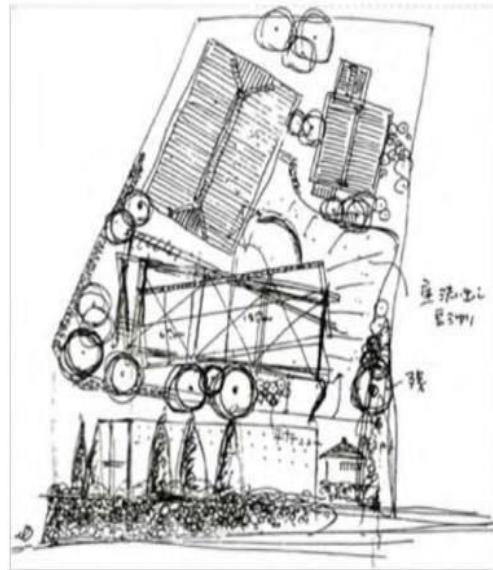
Illustrates a sketch plan of Church with bisecting wall
